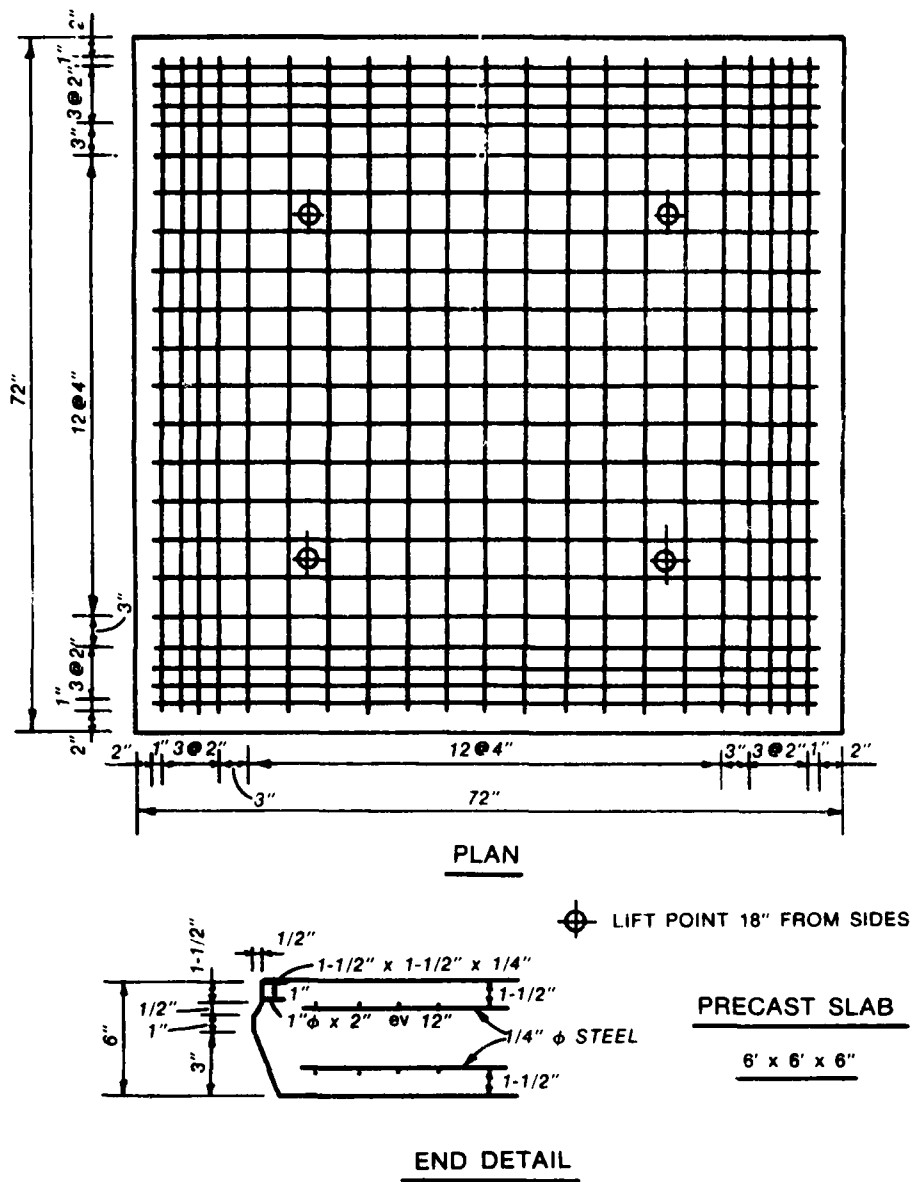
Design of 6-Foot by 6-Foot Reinforced Concrete Slab.
